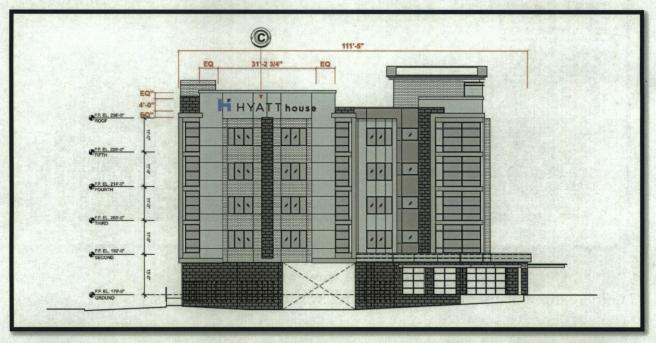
Freeway Oriented Wall Sign (Facing N. Wolfe Road On-Ramp / I-280)
